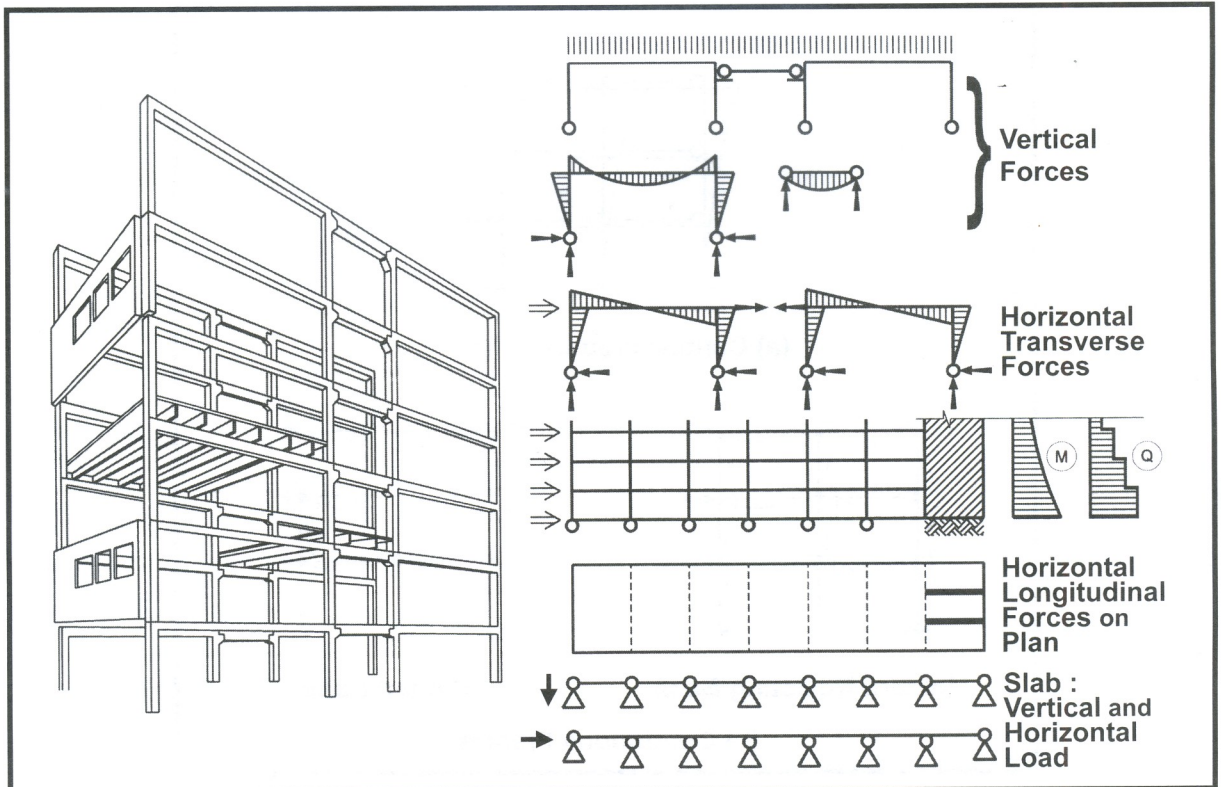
In-Plane Action Of Precast Concrete Walls
